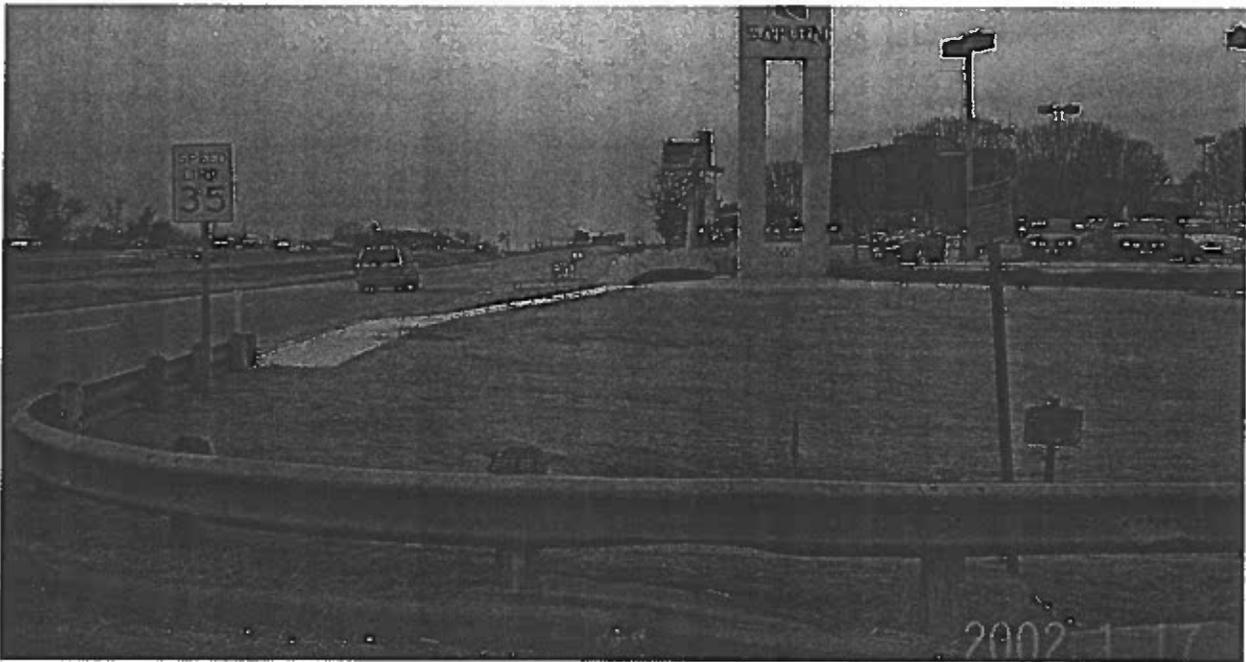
Looking south from south bank of Calloway Branch, west of IH-820, at developed area adjacent to existing right of way. Buried cable markers only hint at totality of buried utilities. Flagged stake indicates limit of proposed new right of way.
